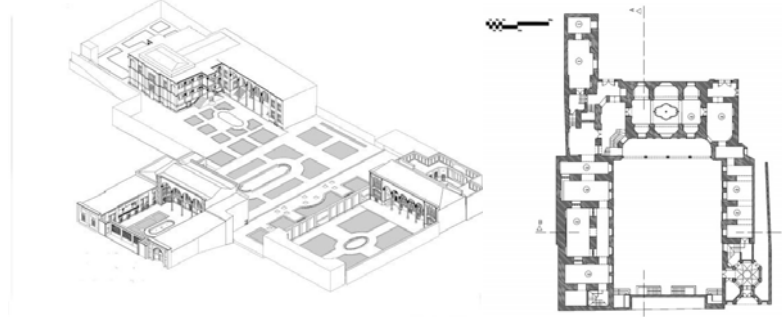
& 10. A south-east axonometric view of three traditional houses in Tabriz, from west to east: Ganjeii House, Gadaki House and Behnam House – left picture. Note that none of them has a summer living quarter. First floor plan of the Gadaki House – right picture (Source: Ghobadian, 2009: 78 & 81)
